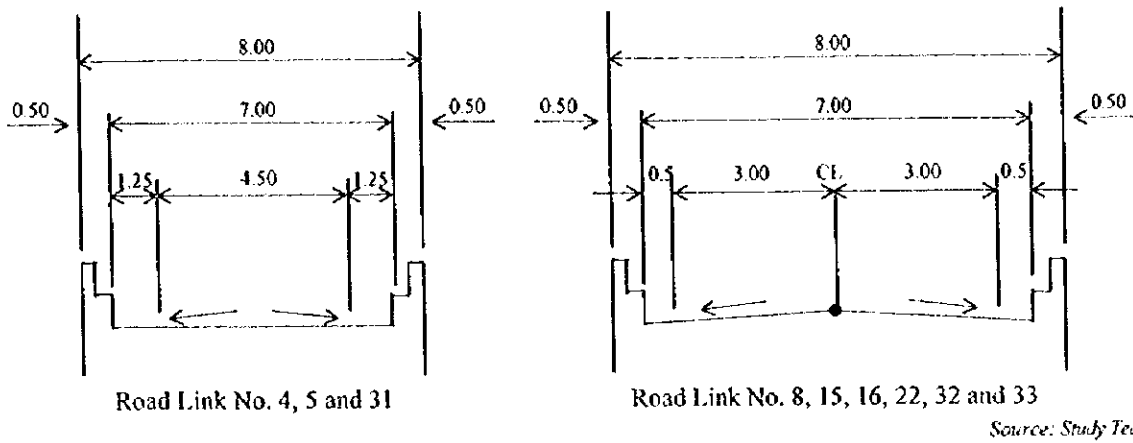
Typical Cross Section of New Bridge for Road Link of Pre-F/S
